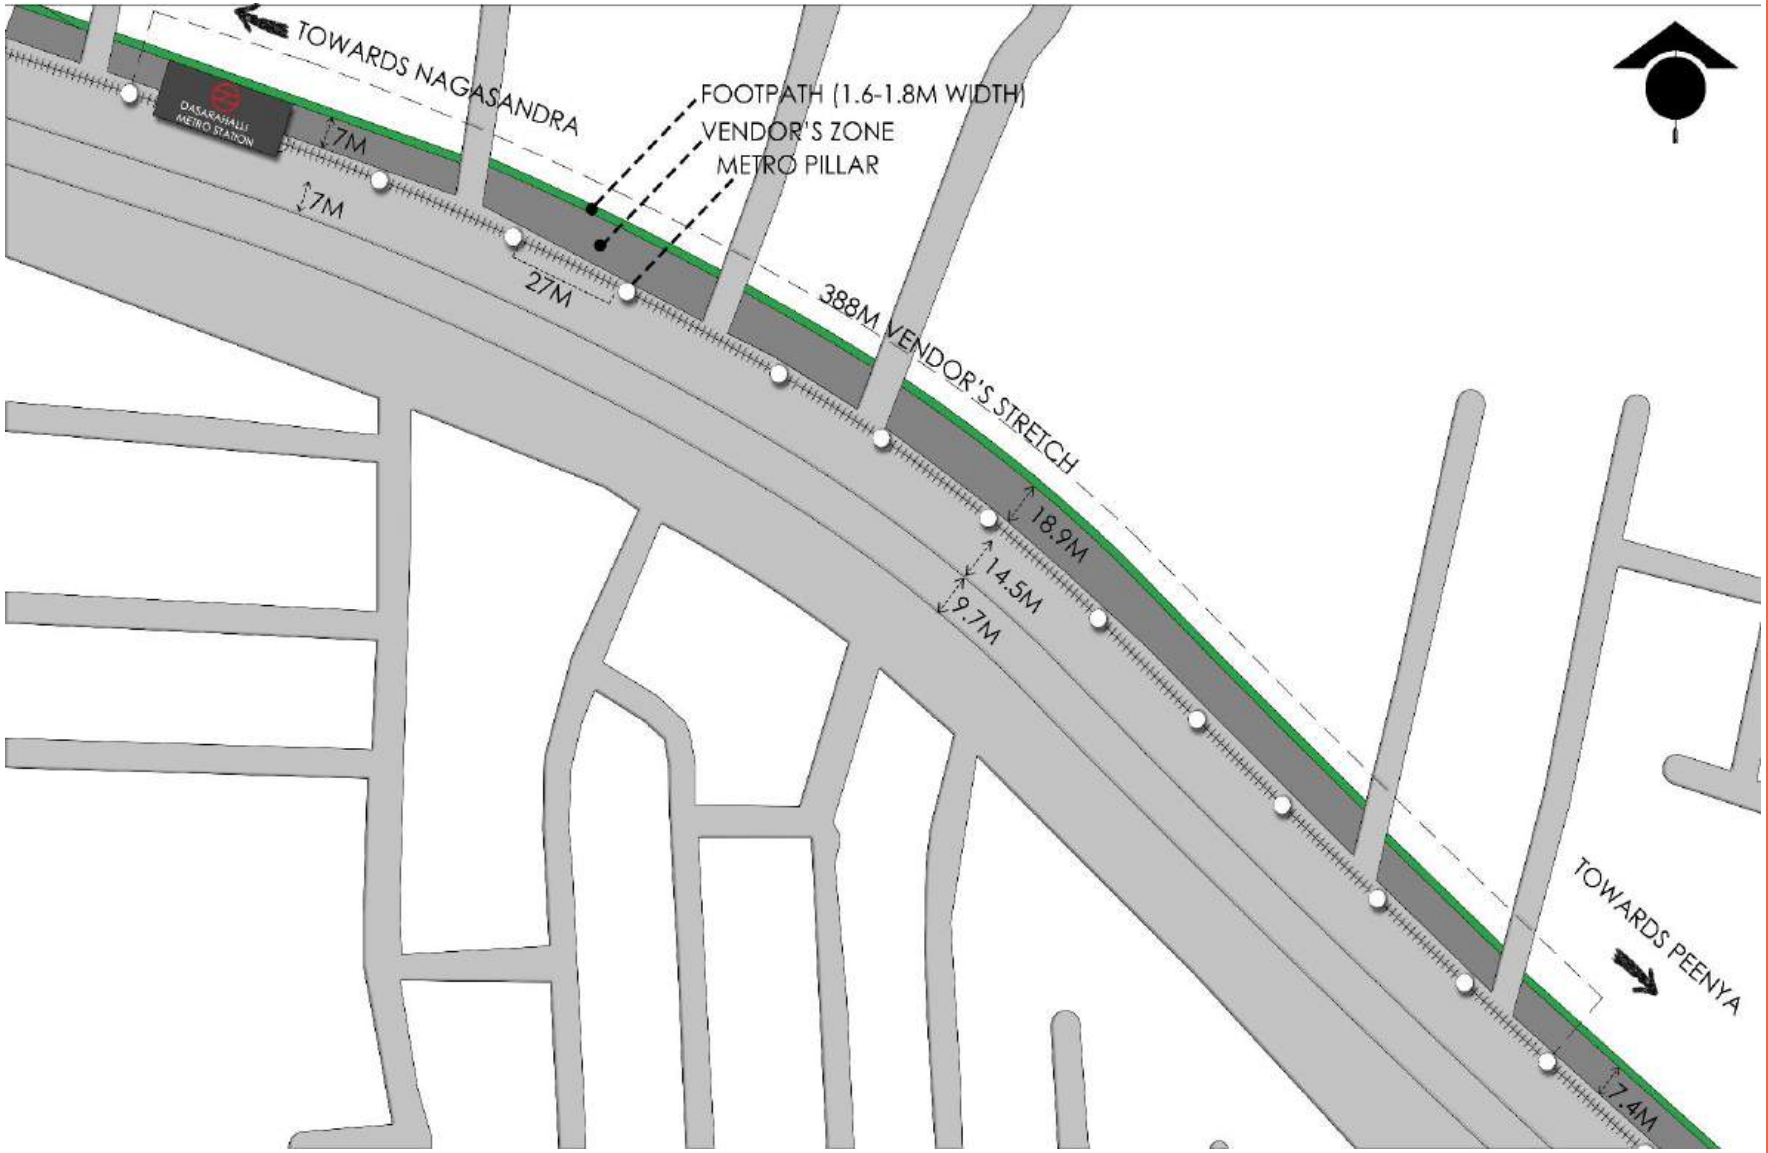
Proposed Vendor Zone from Dasarahalli to Jalahalli.
